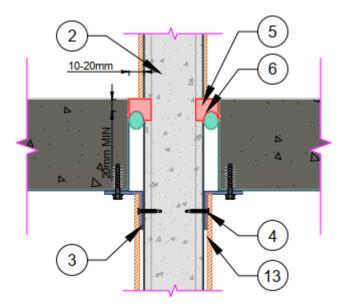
Dual wall system with vertical wall between horizontal walls – gap width of 10-20 mm between the stair and vertically oriented wall
